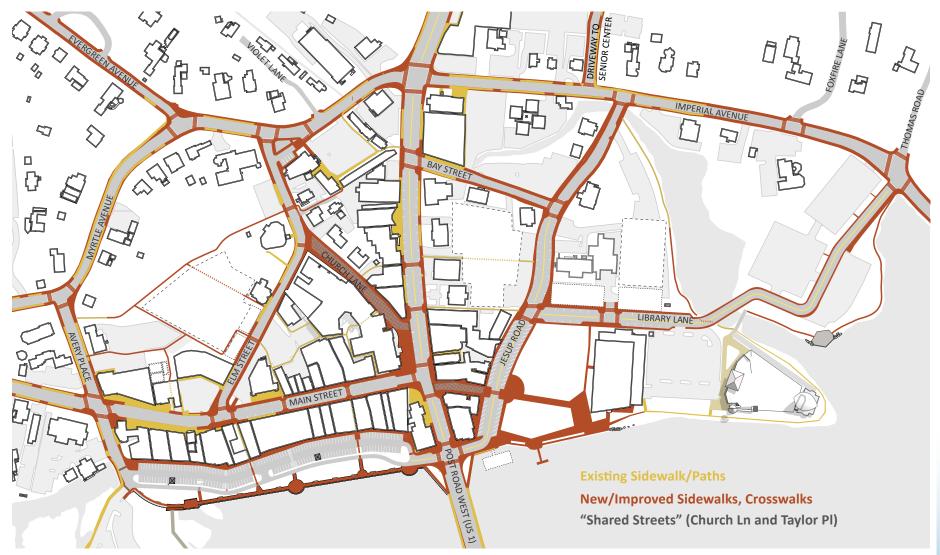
This illustration highlights the future pedestrian network of sidewalks, shared streets, passageways, and crossing enhancements
